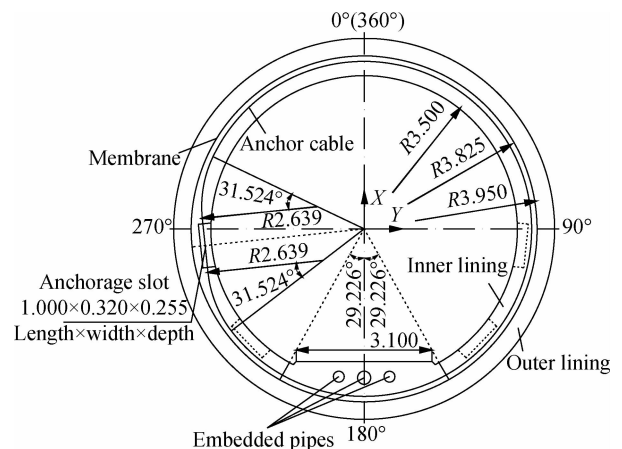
Schematic of the cross section of the tunnel lining (unit: m)
